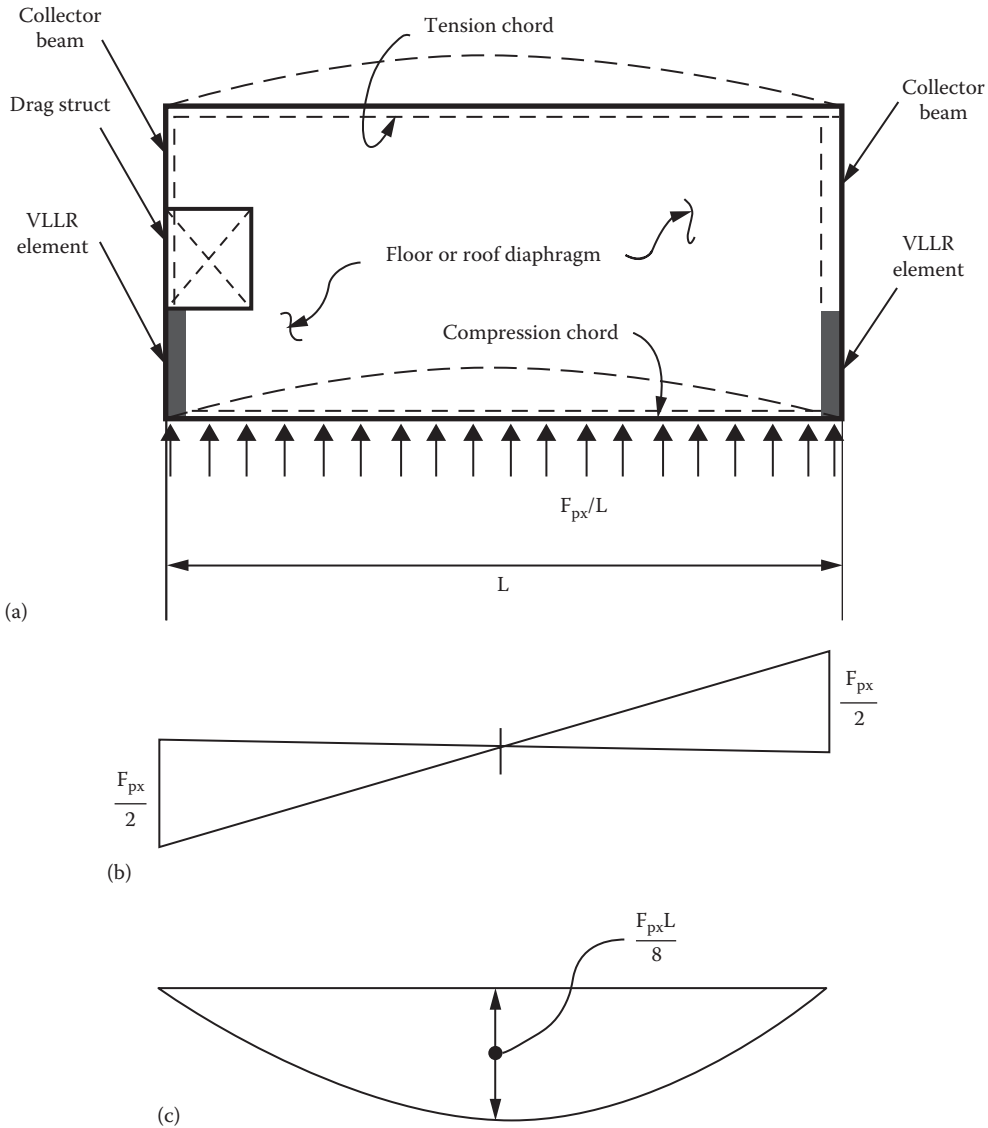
Diaphragm design terminology: (a) plan, (b) shear force diagram, and (c) bending moment diagram. *Note:* F_{px} diaphragm design force (see ASCE 7-10 Section 12.10.1.1).
